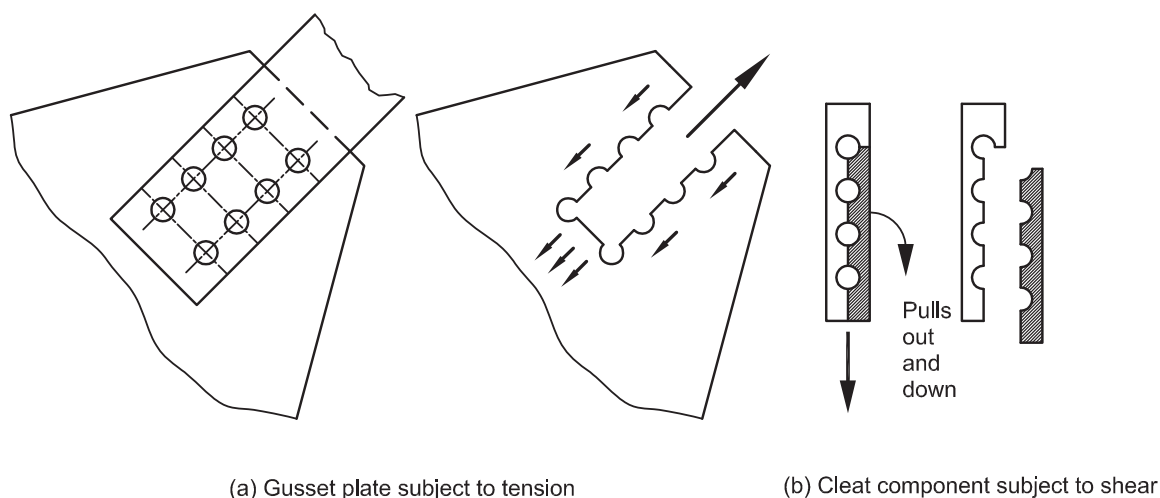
EXAMPLES OF BLOCK SHEAR FAILURE IN COMPONENTS
